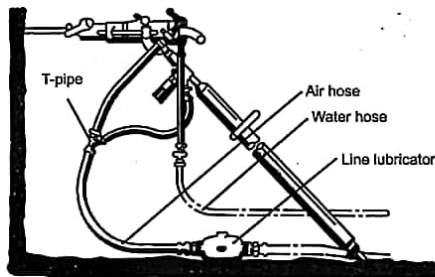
An oil bottle (line lubricator) for a jack hammer.
